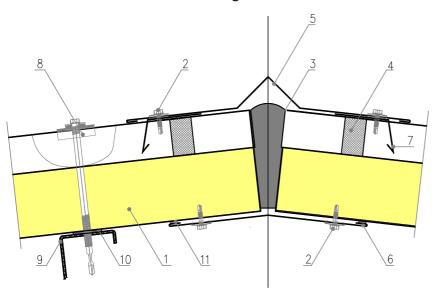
IzoRoof PIR/PIR+; MWF; EPS - roof ridge
